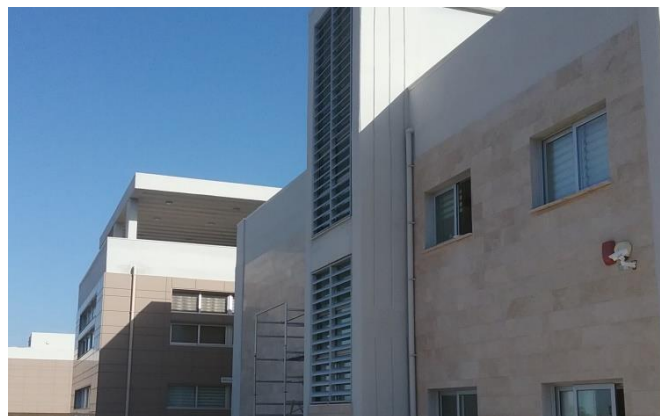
Selective Shading of Windows at Emu Admin Building - West Facade
